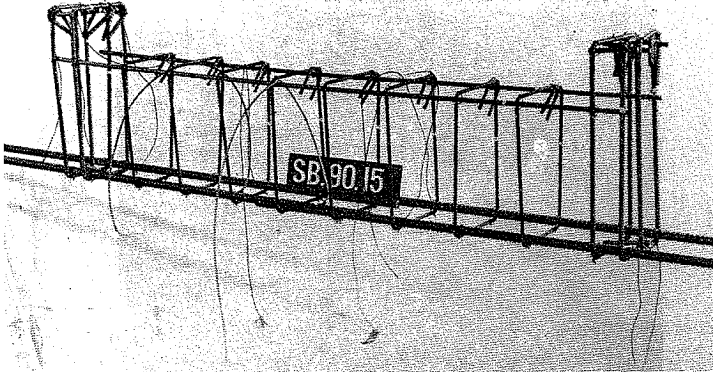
An example of S.B.-specimen reinforcement arrangement type I.
